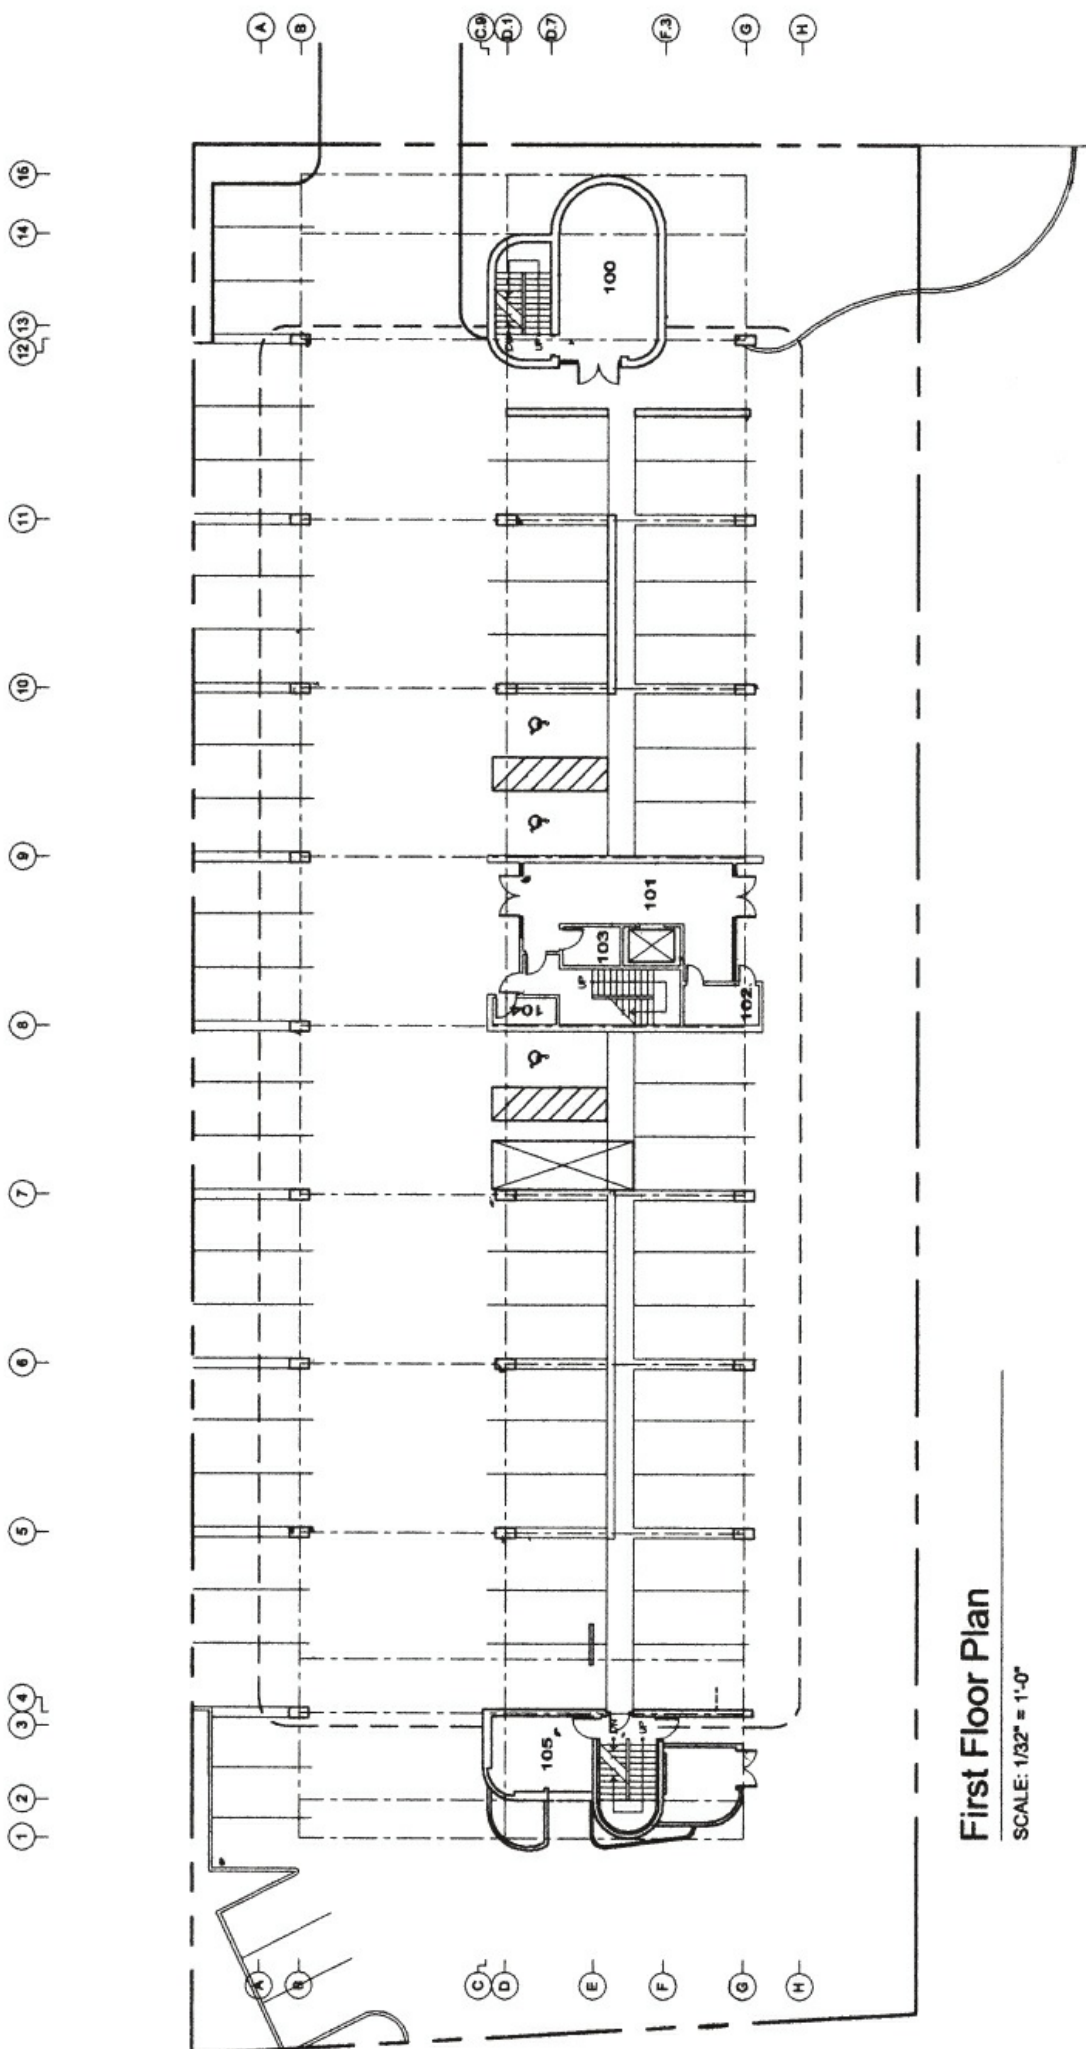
Madison Building—Stage III: Working drawing—ground...floor plan.
